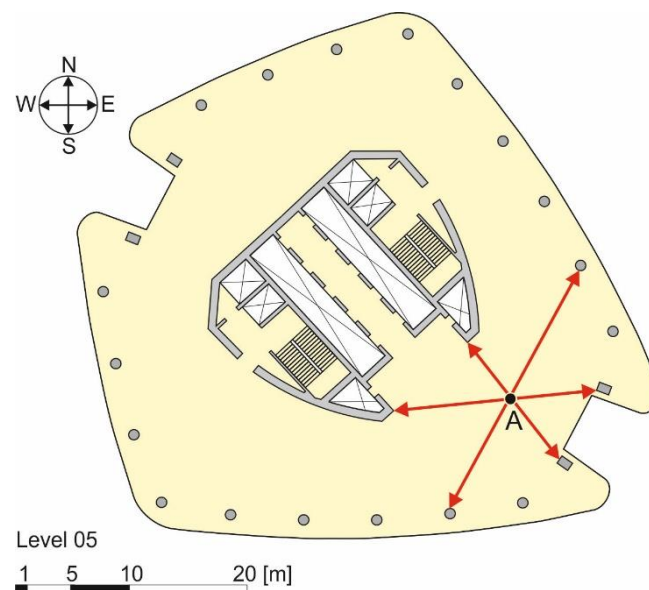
Plan of the fifth floor of the Generali Tower (by Zaha Hadid Architects) in Milan.
